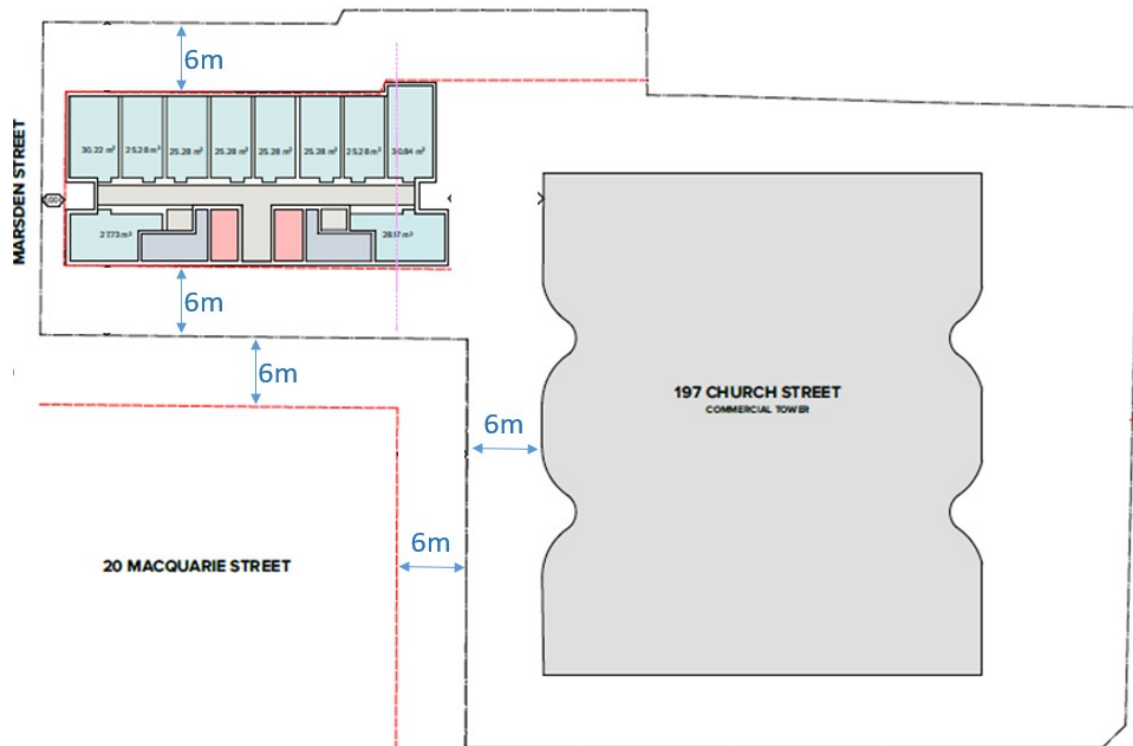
Block plan of 197 Church Street indicating the setbacks sought by the applicant in a recent submission to Council.
